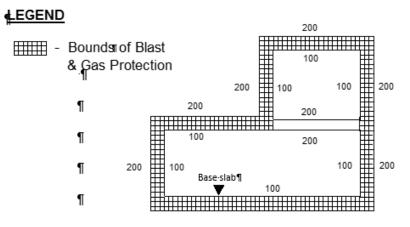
Section showing reinforcement spacing of a typical 2-storey public shelter
